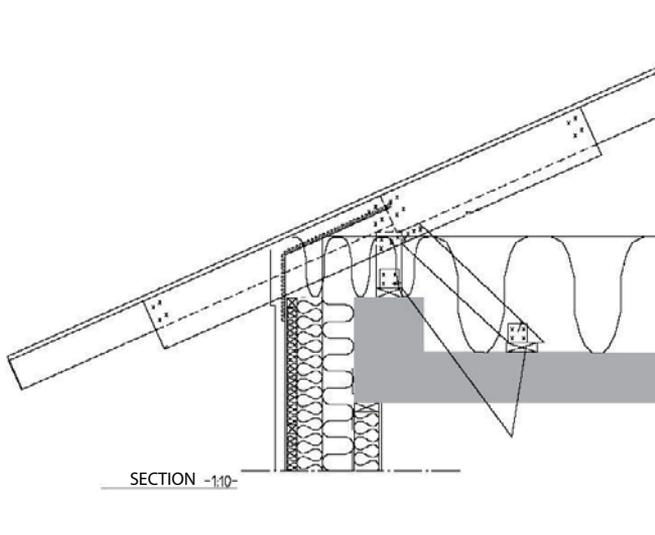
Roof in building with two storeys (bsv arkitekter).
